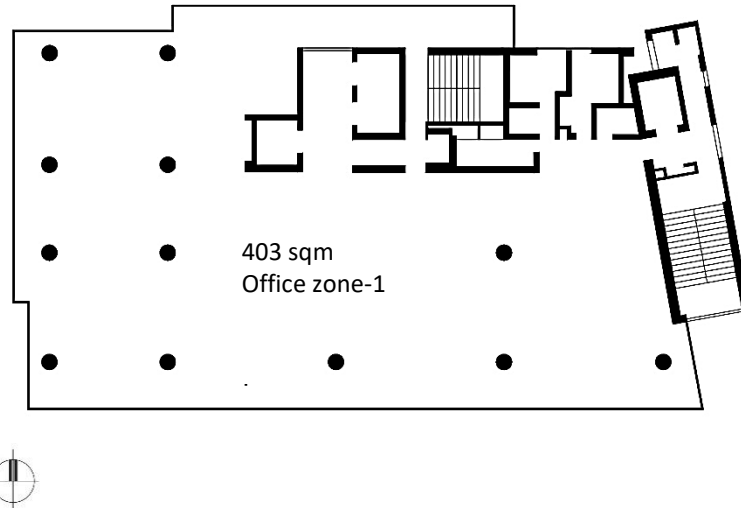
Navana Pristine Pavilion 12th floor plan (Source: dotbangladesh.com)
